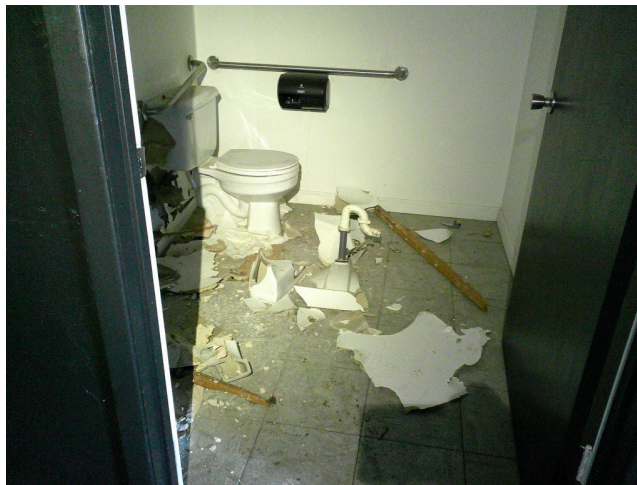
1334 West Fremont Street building drywall/joint compound, wall texture and tile grout/mortar.
